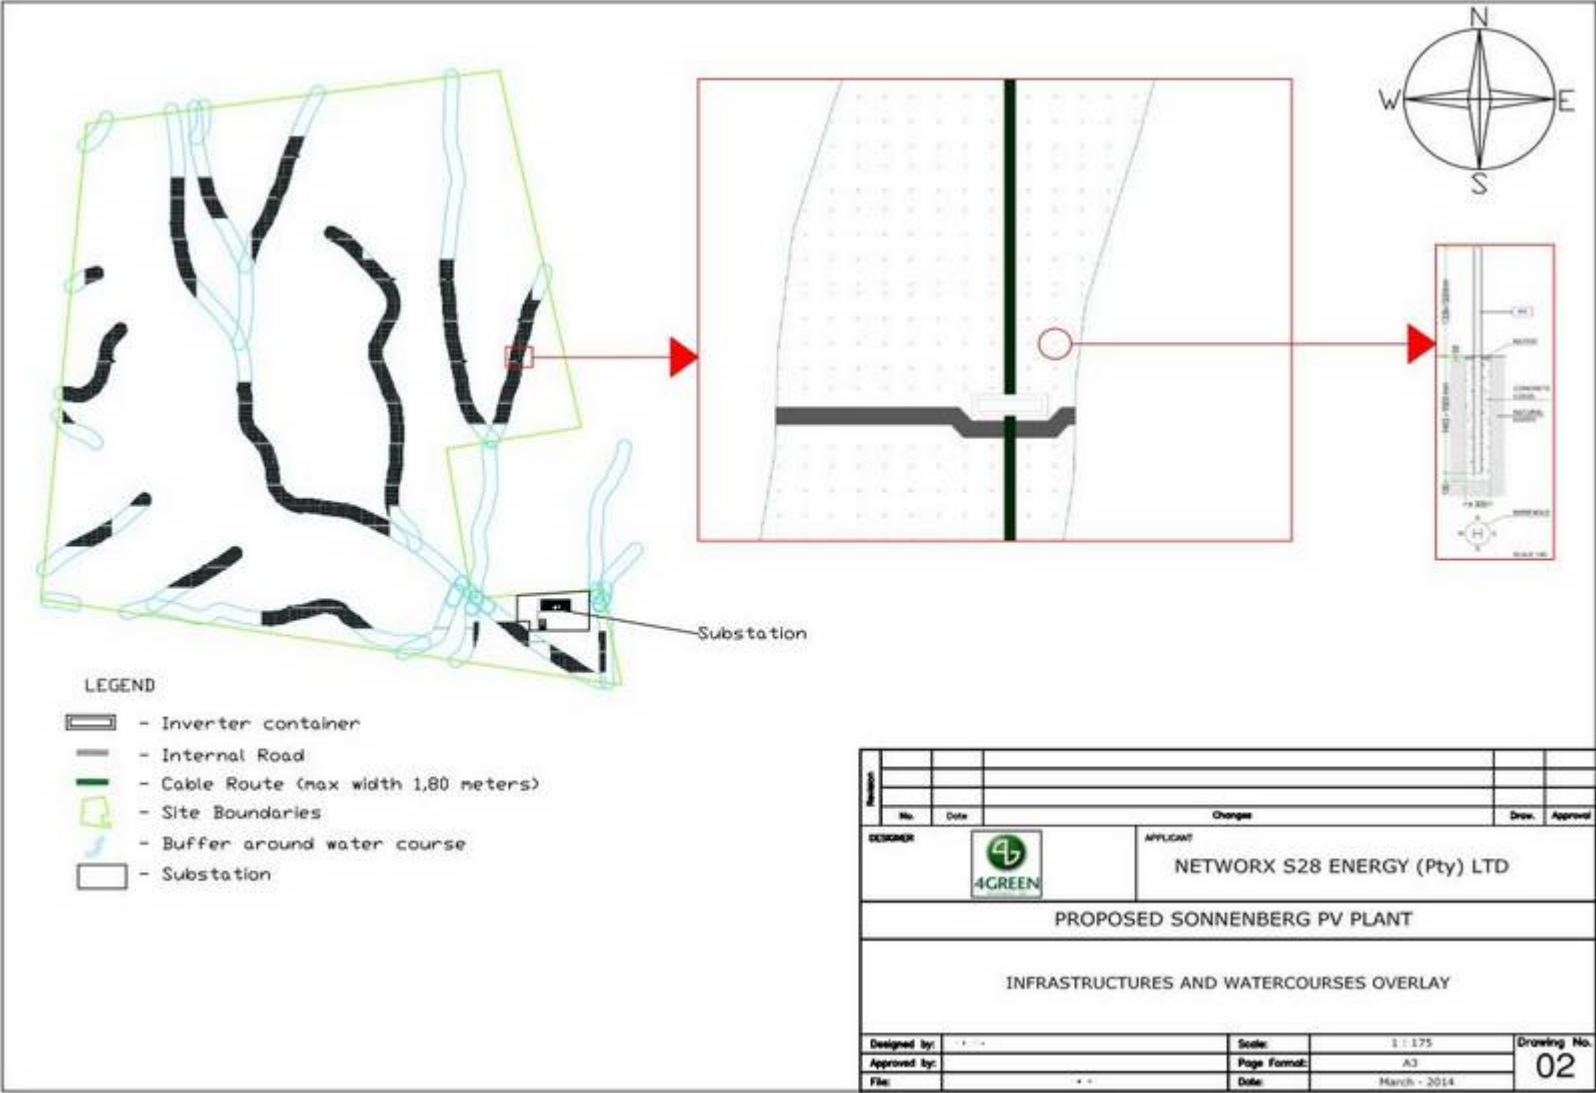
Map indicating watercourse crossings due to PV array foundations (pilings) and gravel access road sections
